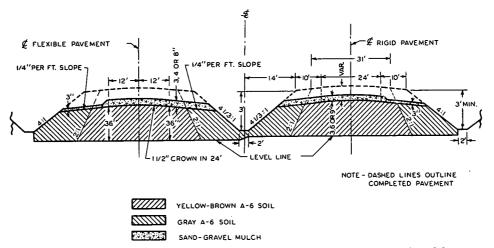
Typical cross-section of A-6 soil embankment with sand-gravel mulch cover.
